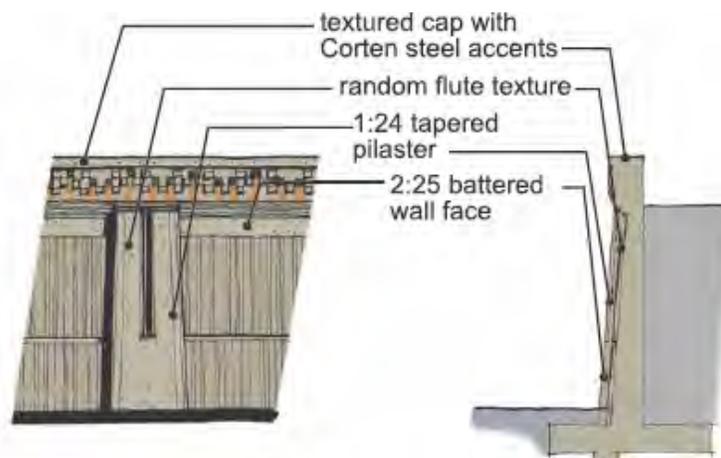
Southbound/northbound cut wall, elevation and section
